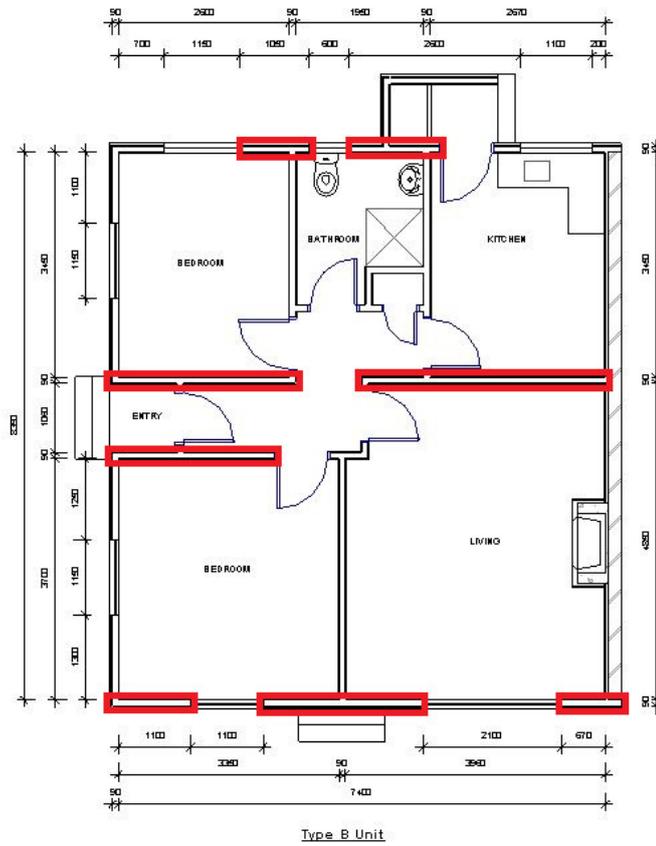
Walls used for bracing in the longitudinal direction Type B.
